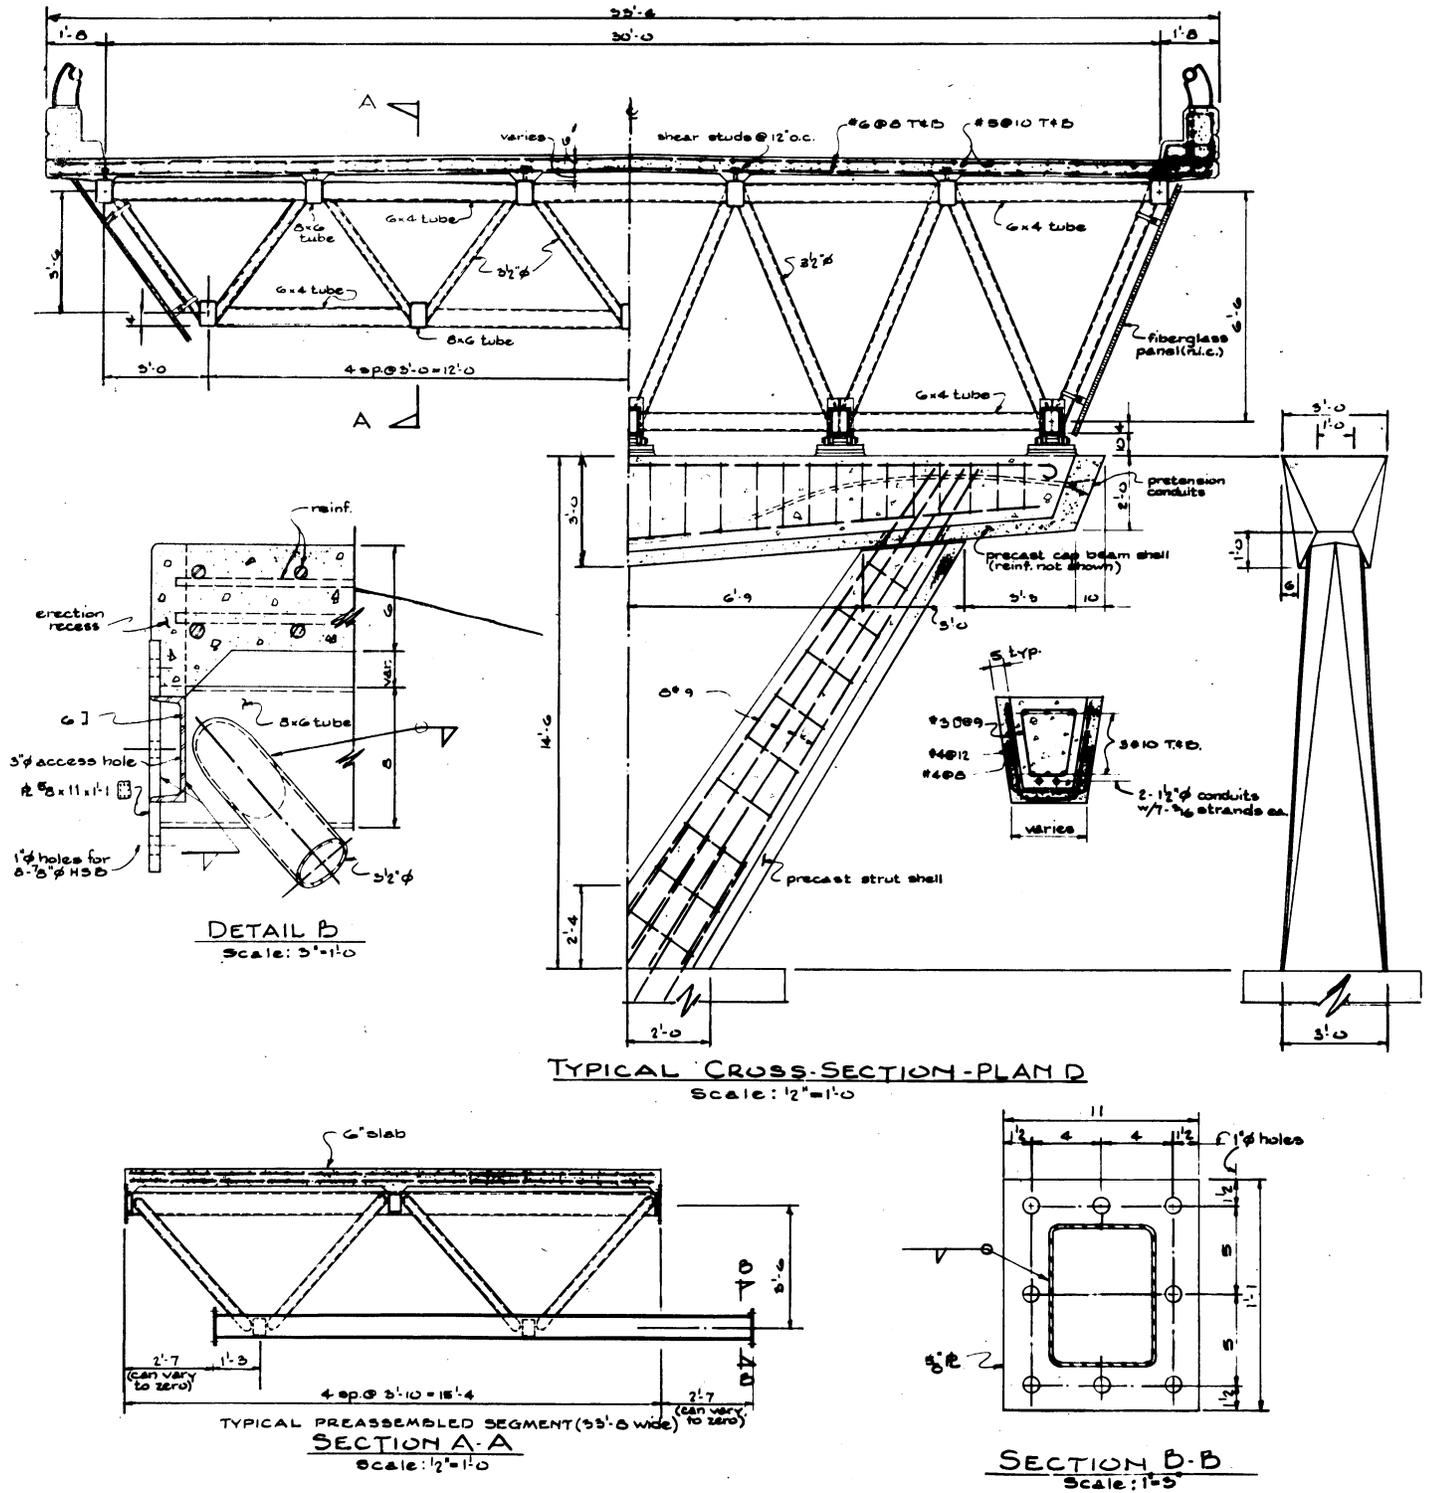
Precast shell assembly with posttensioned cap beam shown with space frame.
